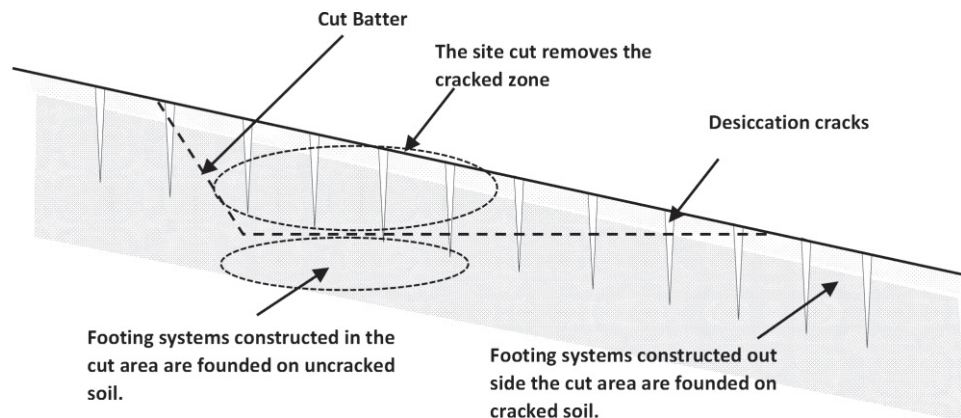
Removal of Cracked Zone of soil profile due to site cutting
